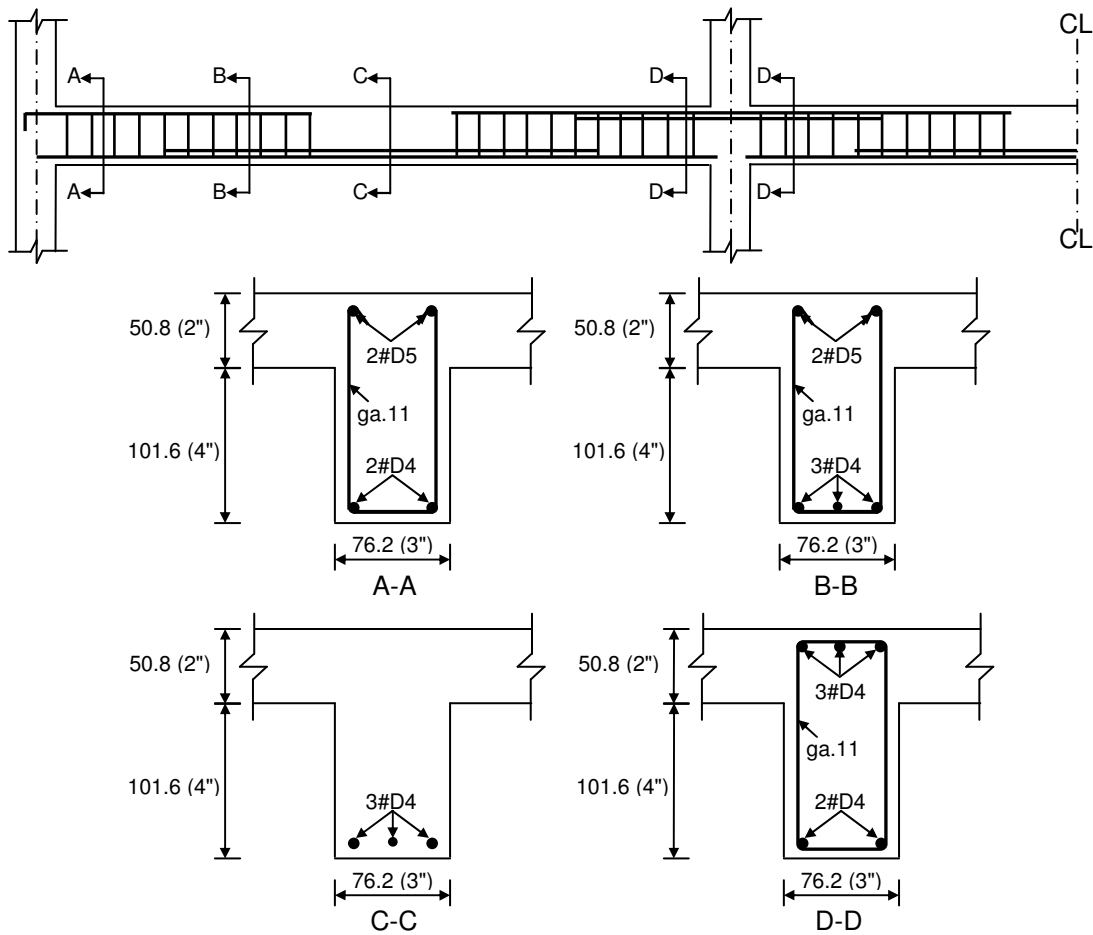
Typical beam reinforcement details for the model structure tested on shake table by Bracci et al (1992, 1995)
